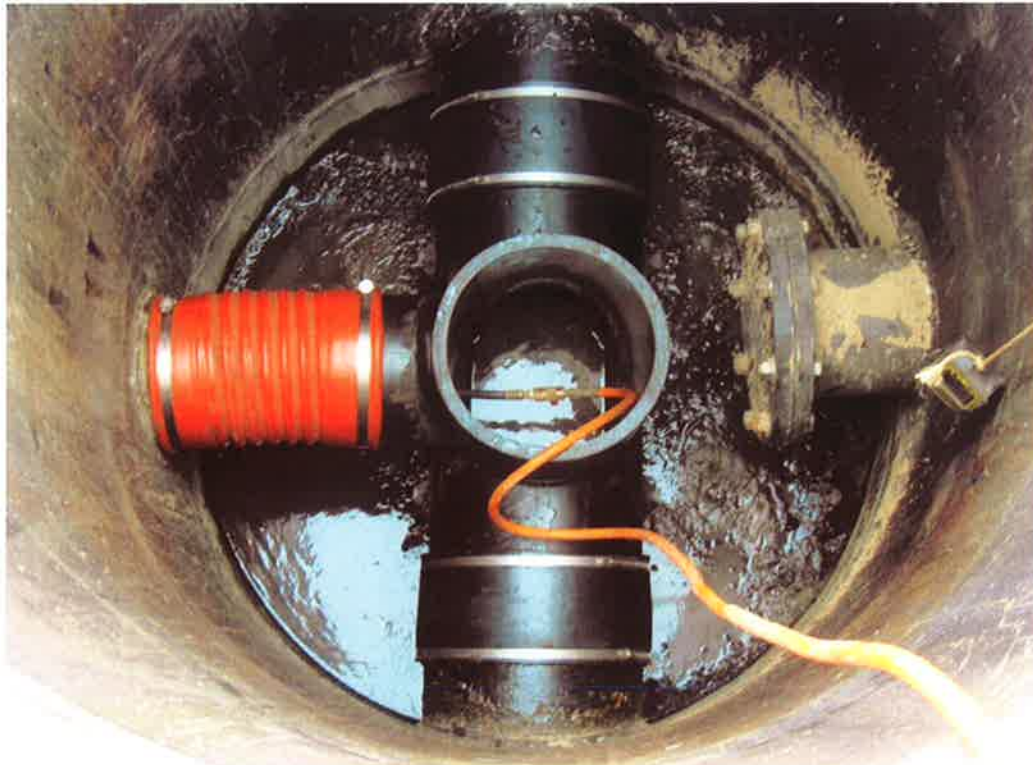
LCM 3 modification with isolation plug prior to installation of Fernco cap.
